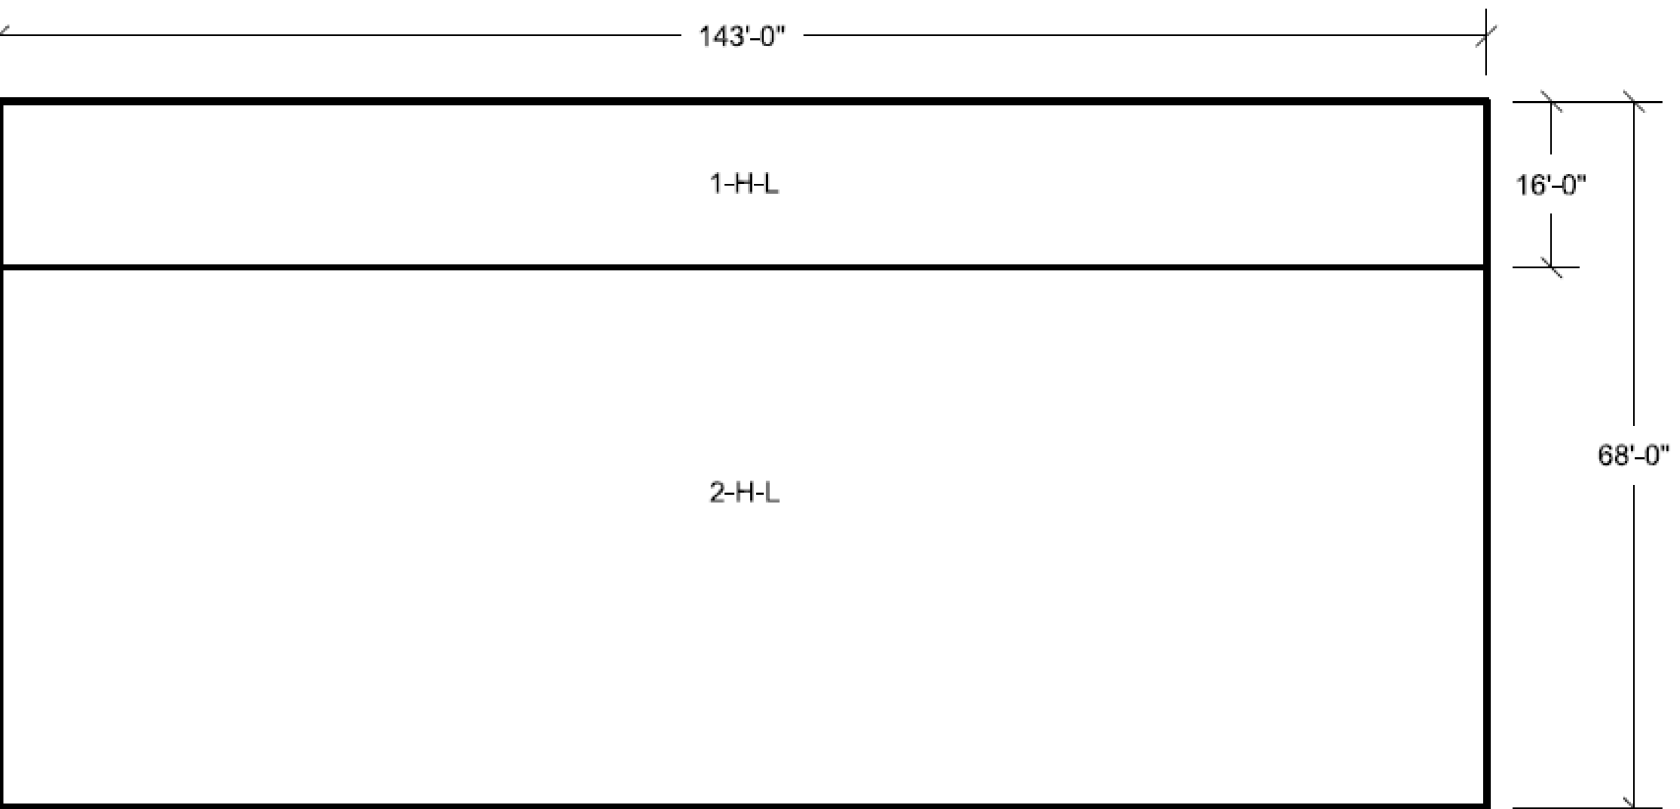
H.6-51 Pump House North Wall Looking South Horizontal Reinforcement Zones Near Side Face
